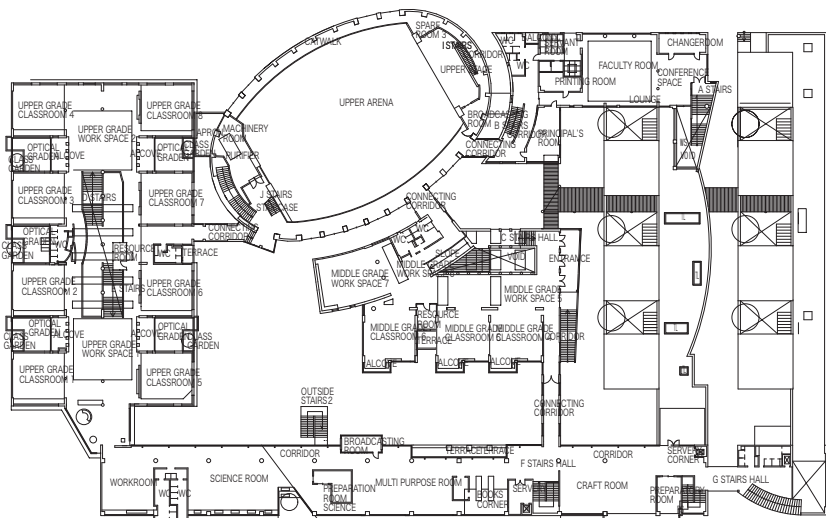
Upper level floor plan of Utase Elementary School, Chiba.
